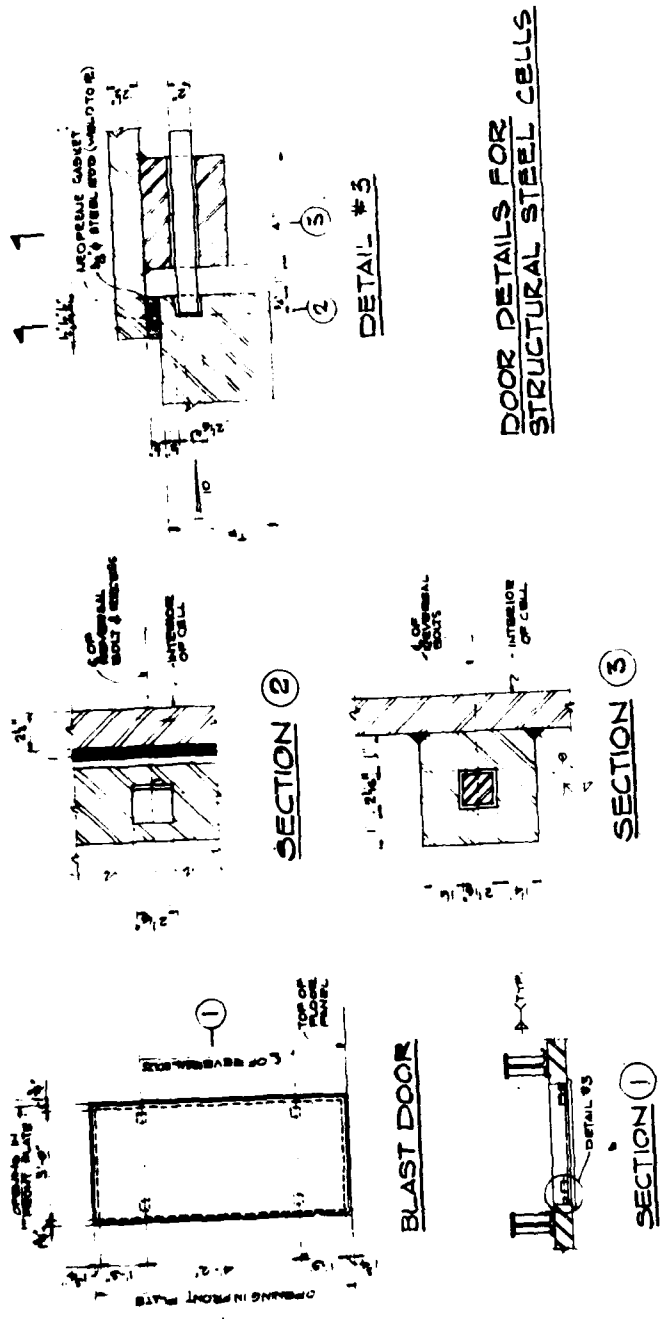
TYPICAL PERSONNEL DOOR DETAILS
